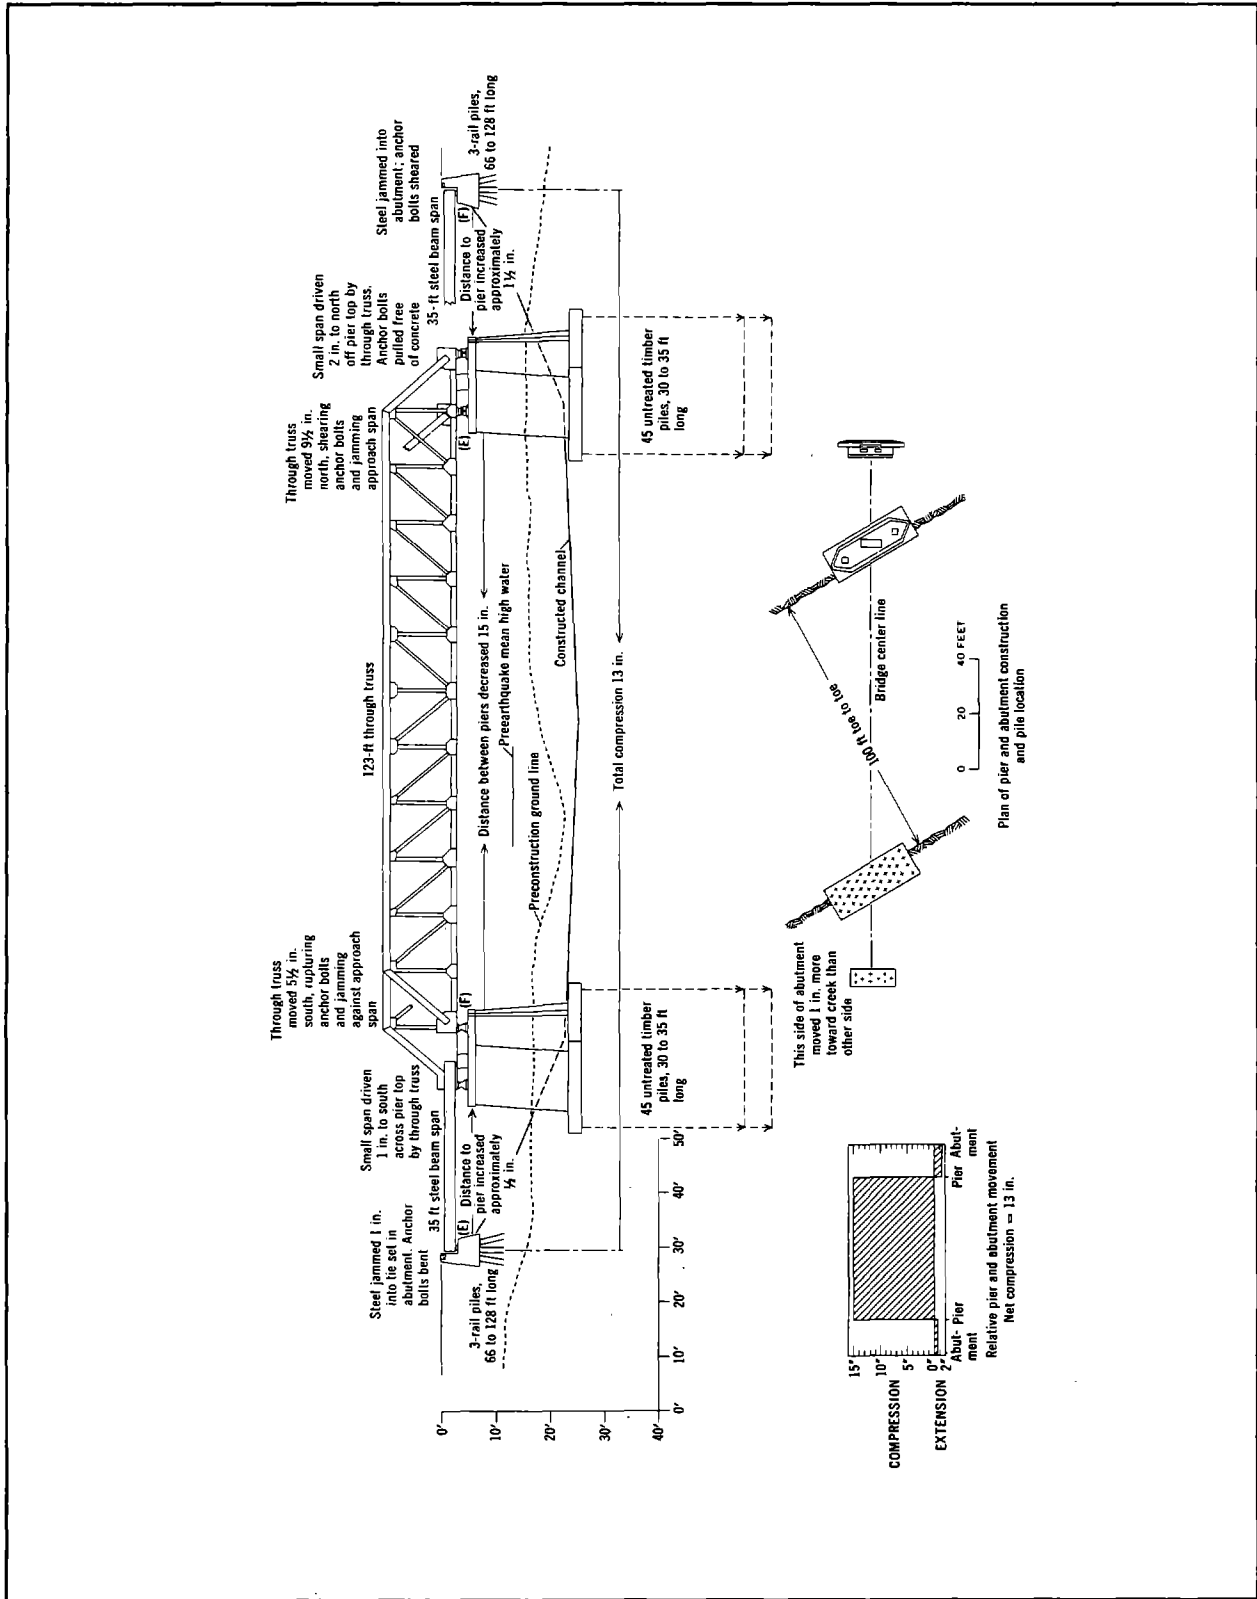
Construction of and Damage to Ship Creek Bridge at Milepost 114.3 (after McCulloch and Bonilla, 1970).
